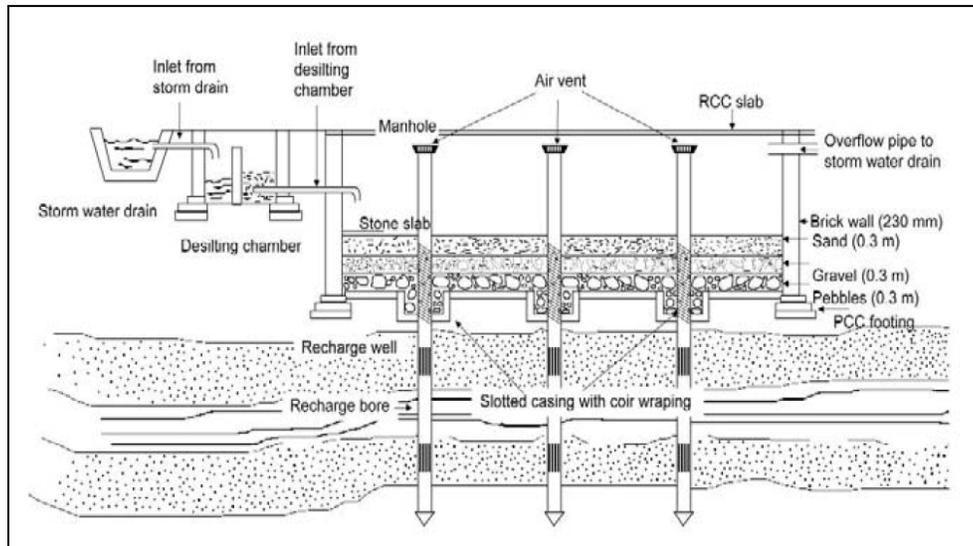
Cross Section of Recharge Trench with Desilting Chamber.
